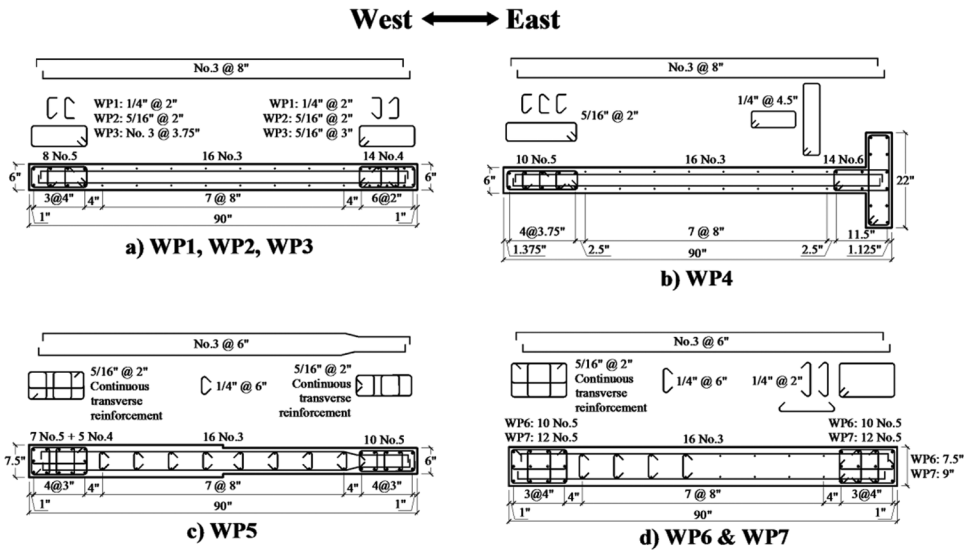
Reinforcement layout: (a) Specimens WP1, WP2, and WP3; (b) Specimen WP4; (c) Specimen WP5; and (d) Specimens WP6 and WP7. (Note: 1 in. = 25.4 mm.)
